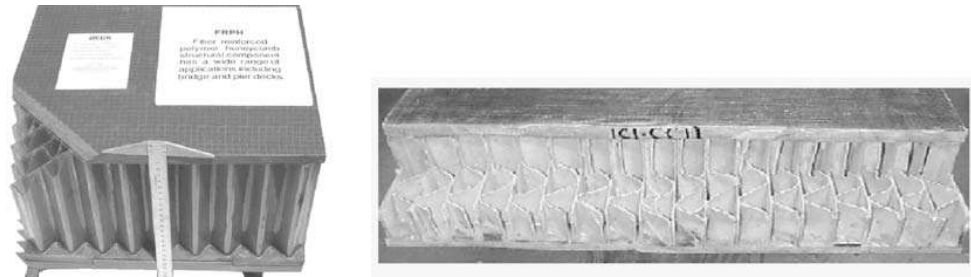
Honeycomb sandwich configuration (Photograph from NCHRP Report 564 – Field Inspection of In-Service FRP Bridge Decks)
